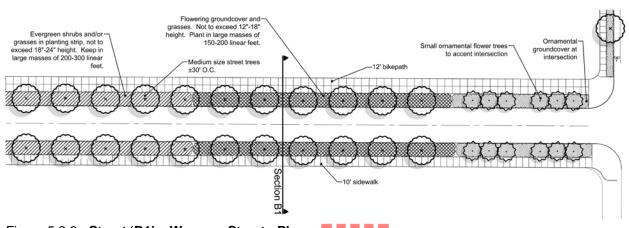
Street 'B1' – Wawona Street - Plan
